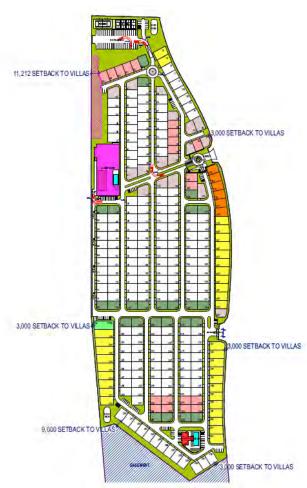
Proposed Manufactured Home Site Development Layout Plan
